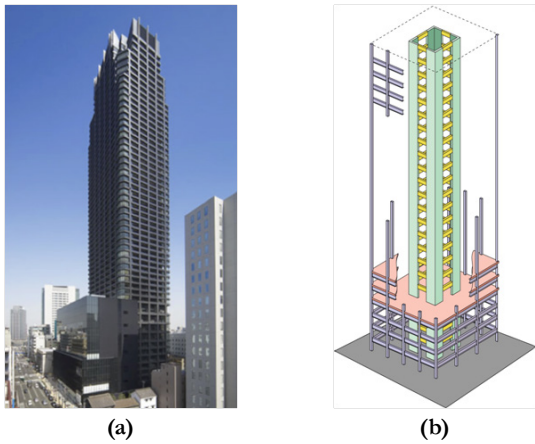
ECC coupling beams were used to enhance seismic safety in the tallest R/C building in Japan. (a) the 60 story Kitahama Building in Osaka, Japan, and (b) schematic showing four coupling beams (in yellow) on each floor level.
